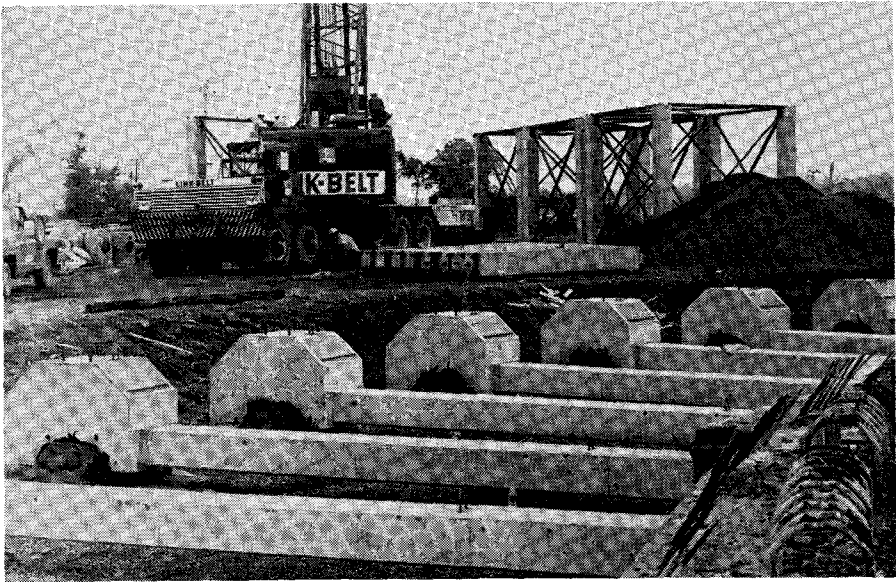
Close-up of precast tie beams and anchorage blocks.
